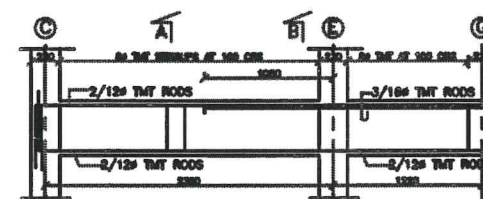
DETAILS OF PLINTH BEAM IN ROWS A, B, H, J & K
